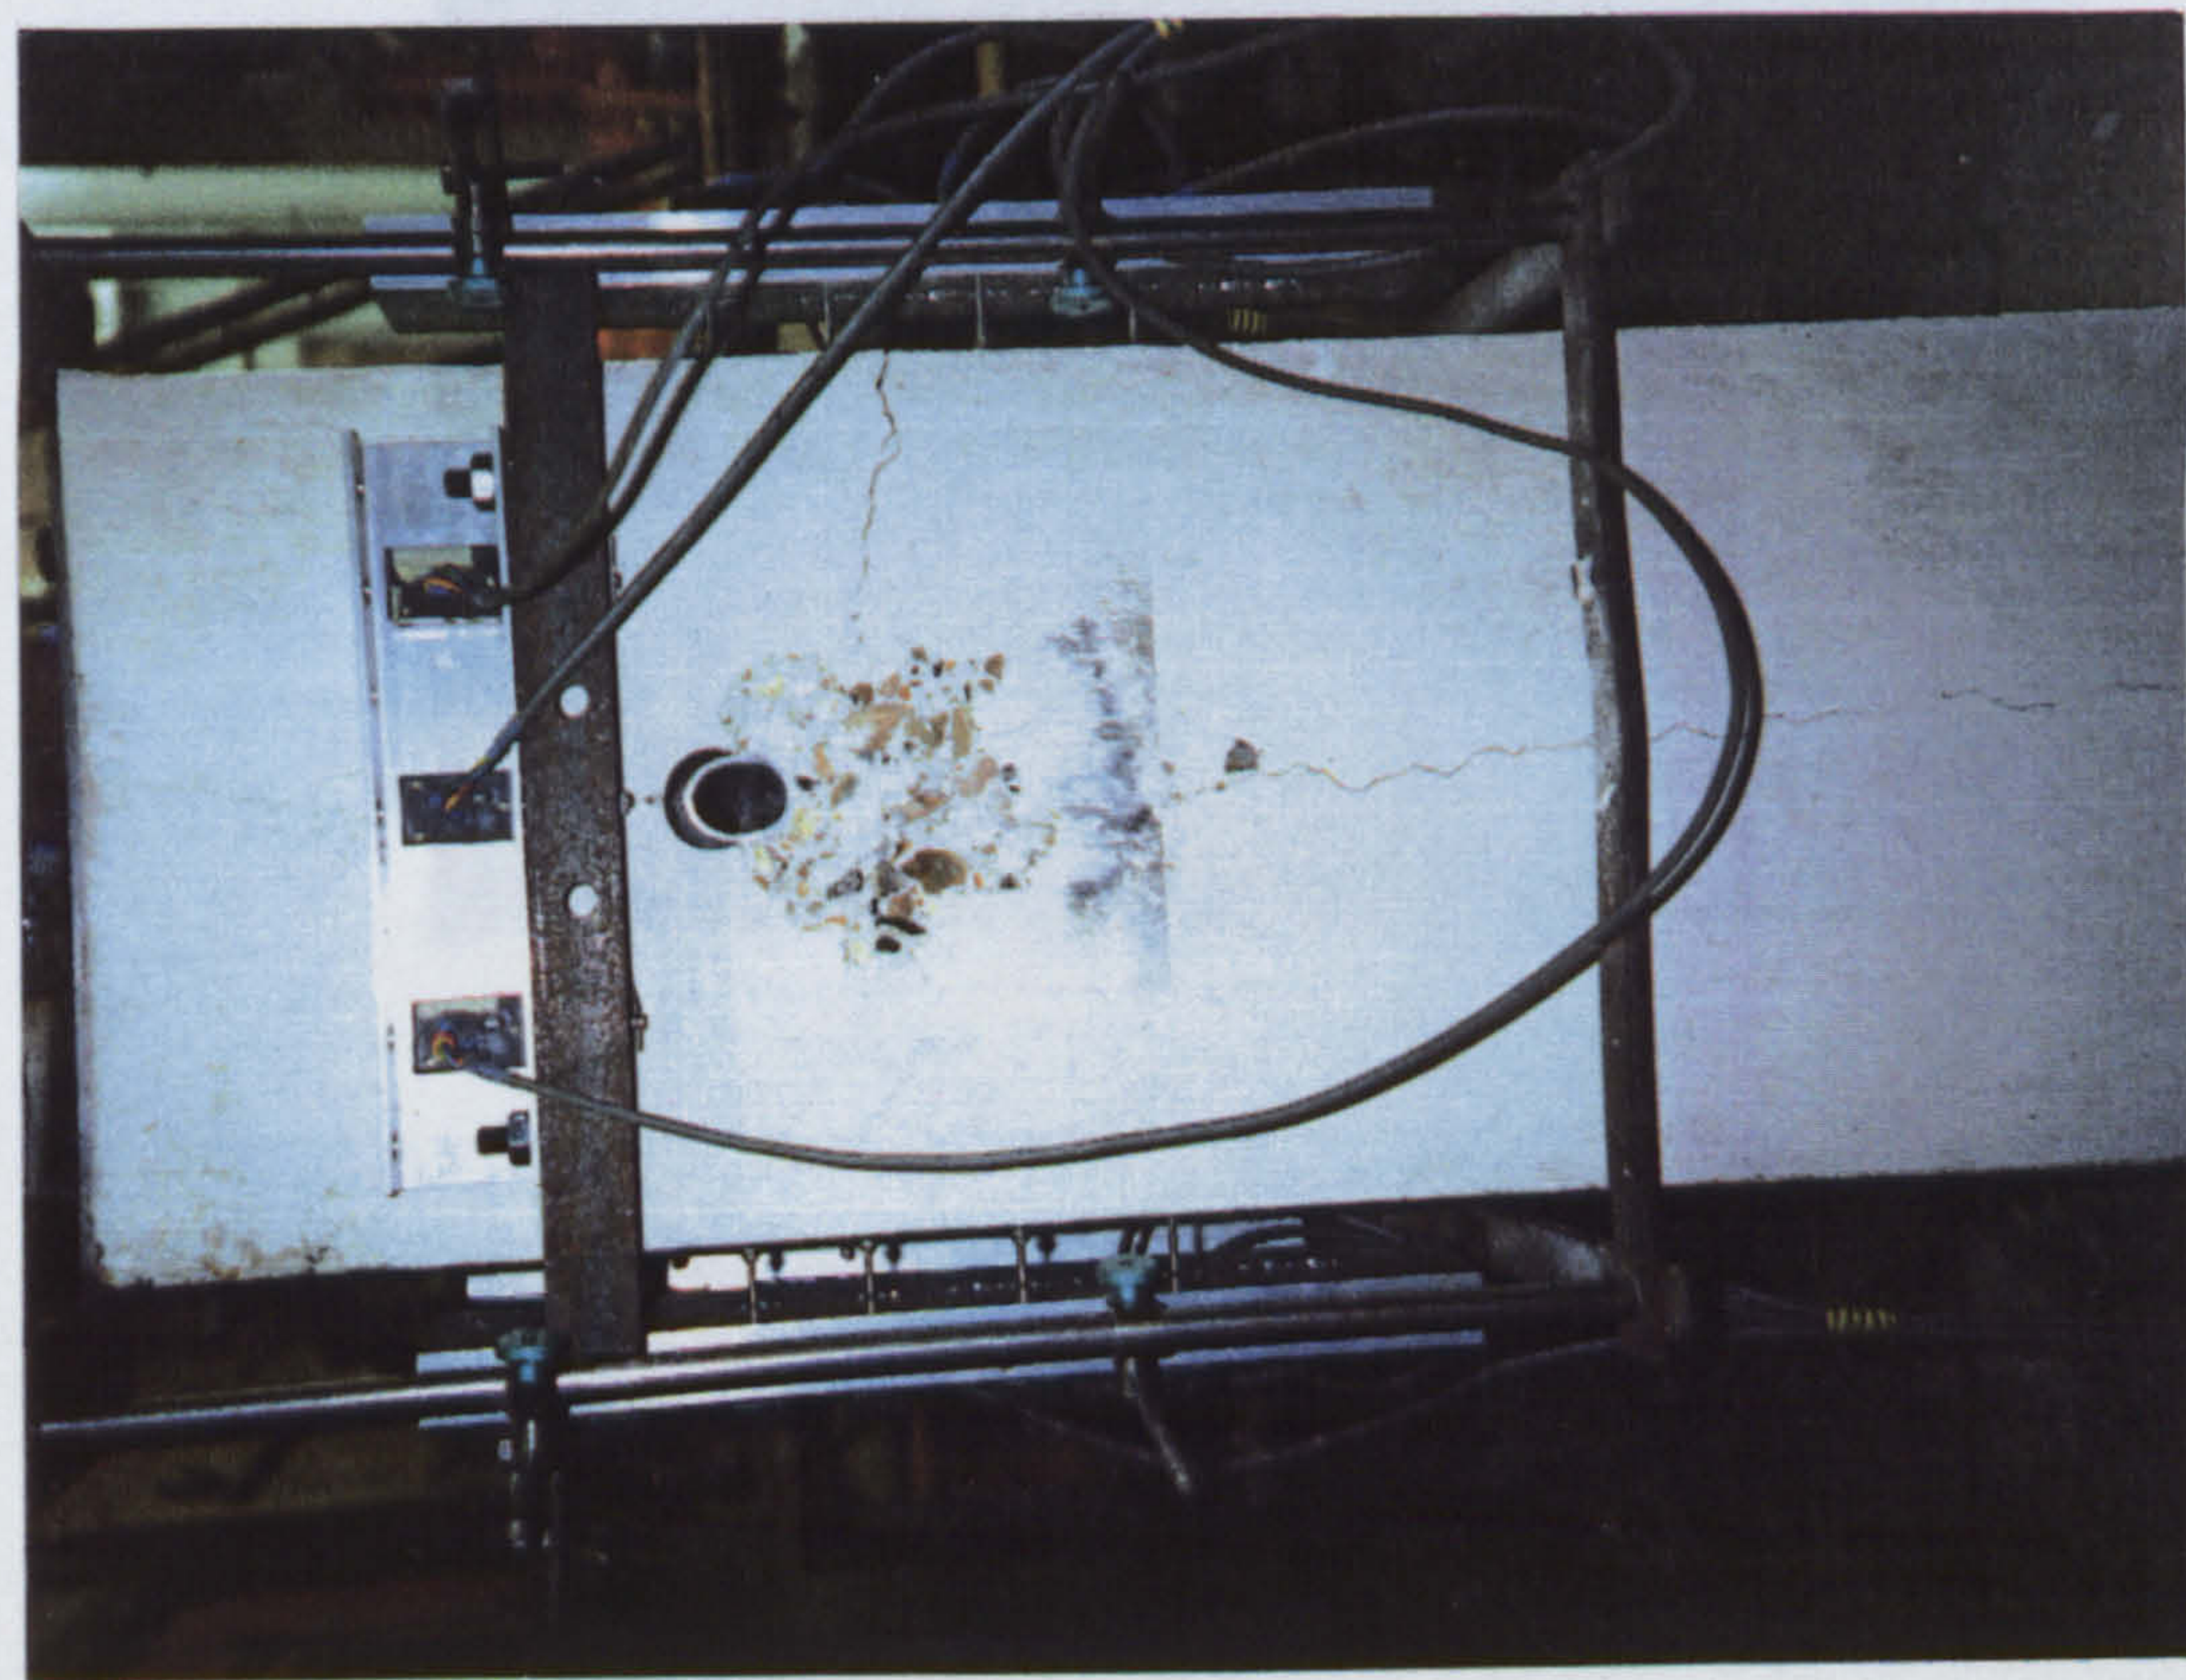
COLUMN FACES SHOWING CRACKS AND SPALLING OF CONCRETE WITH
